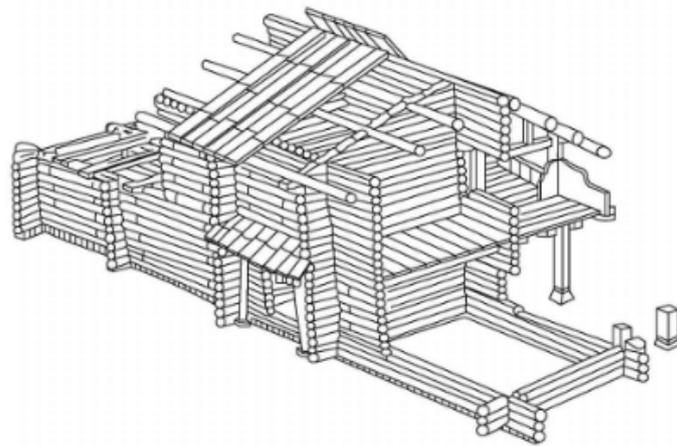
Model and structural schematic of the log-cabin wooden framework (jinggan style), traditionally used in ancient Chinese timber construction.
